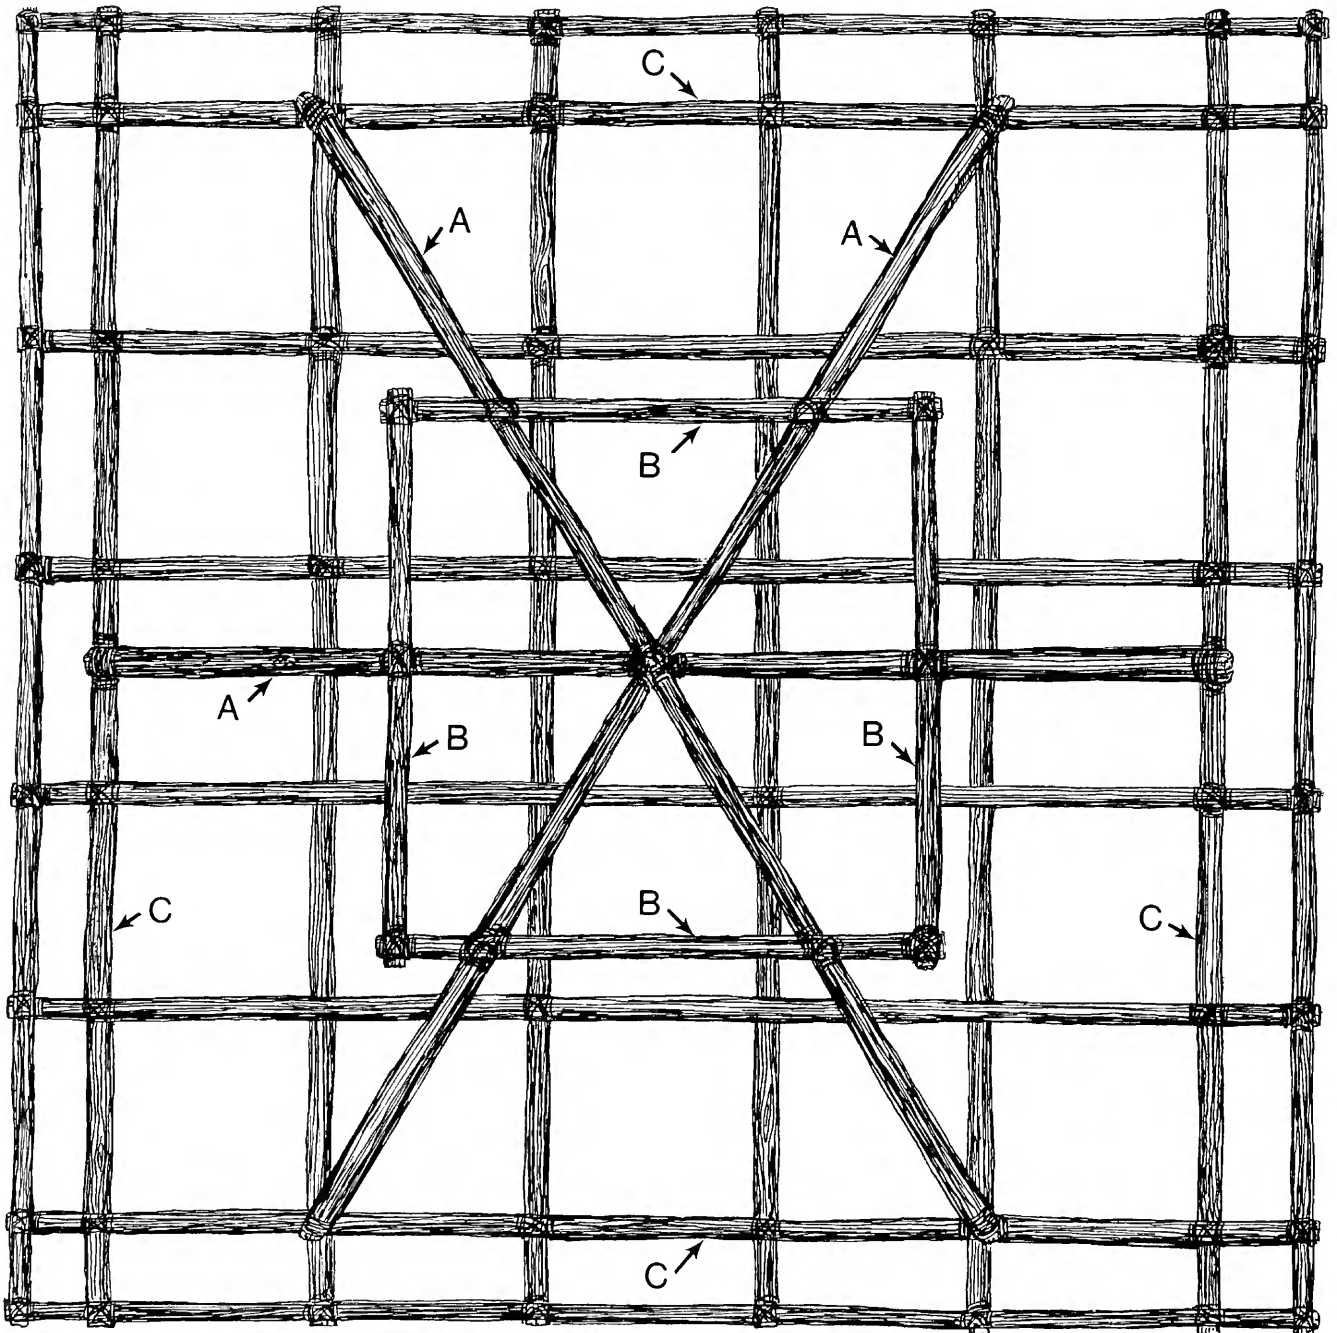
Roof plan of traditional house, A-frame and roof purlins in place: A, main roof beam; B, purlin; C, roof beam plate.
